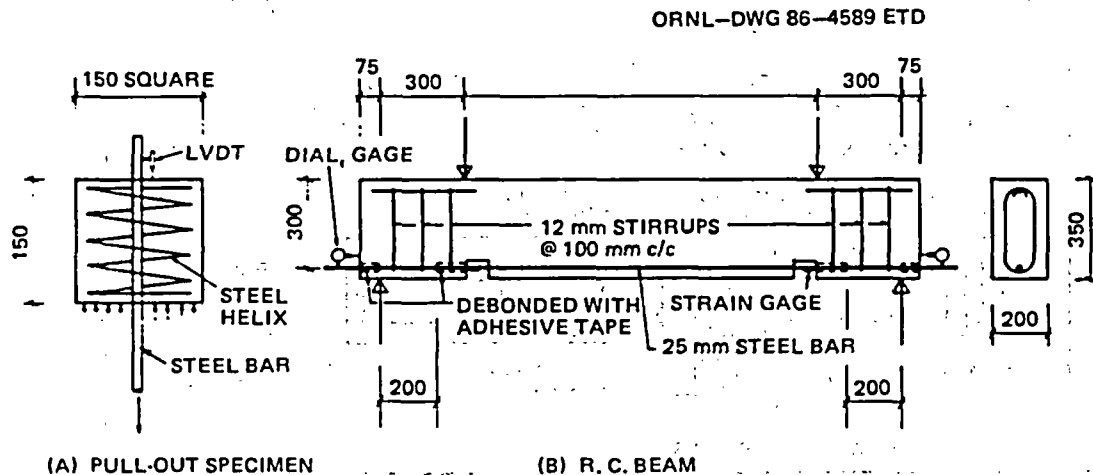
Details of pull-out and reinforced concrete beam test specimens. Source: H. W. Chung, "Epoxy Repair of Bond in Reinforced Concrete Members," *Proc. J. American Concrete Institute* 78(1), January-February 1981.
